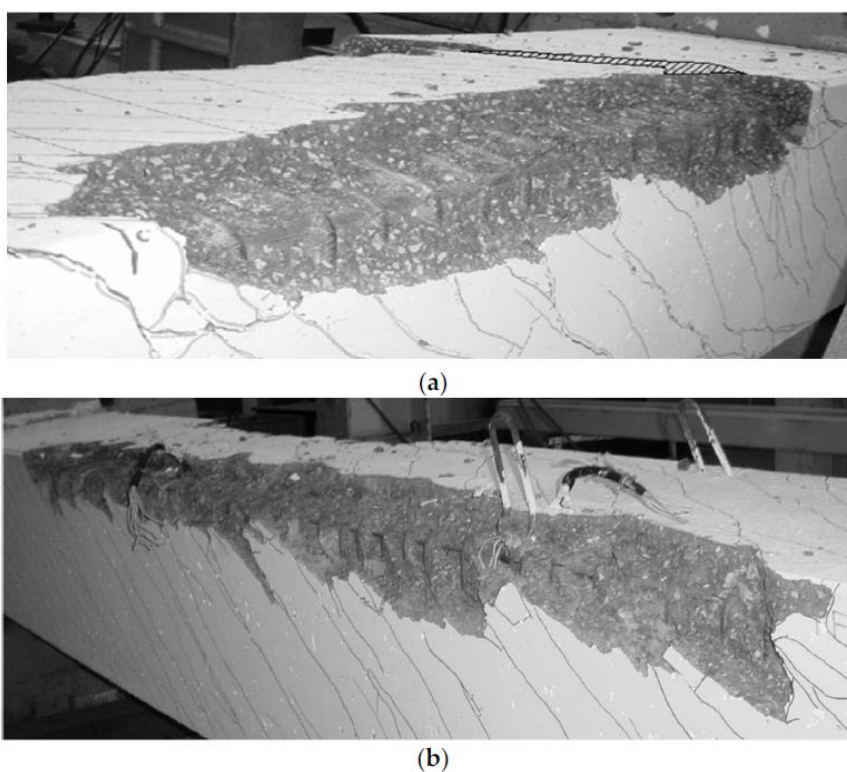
Fragile failure by concrete break off at the corners: (a) Beam D-0 and (b) Beam D-1.79.
